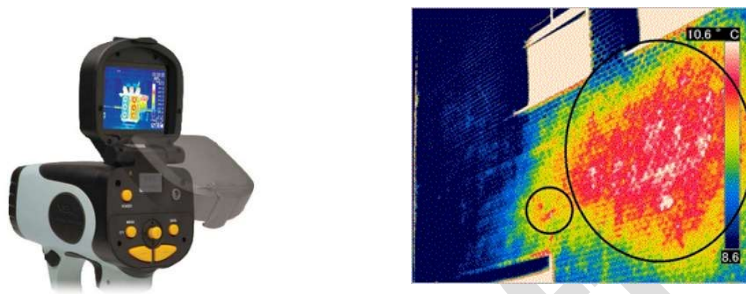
Example of delamination in building exterior walls using thermography
